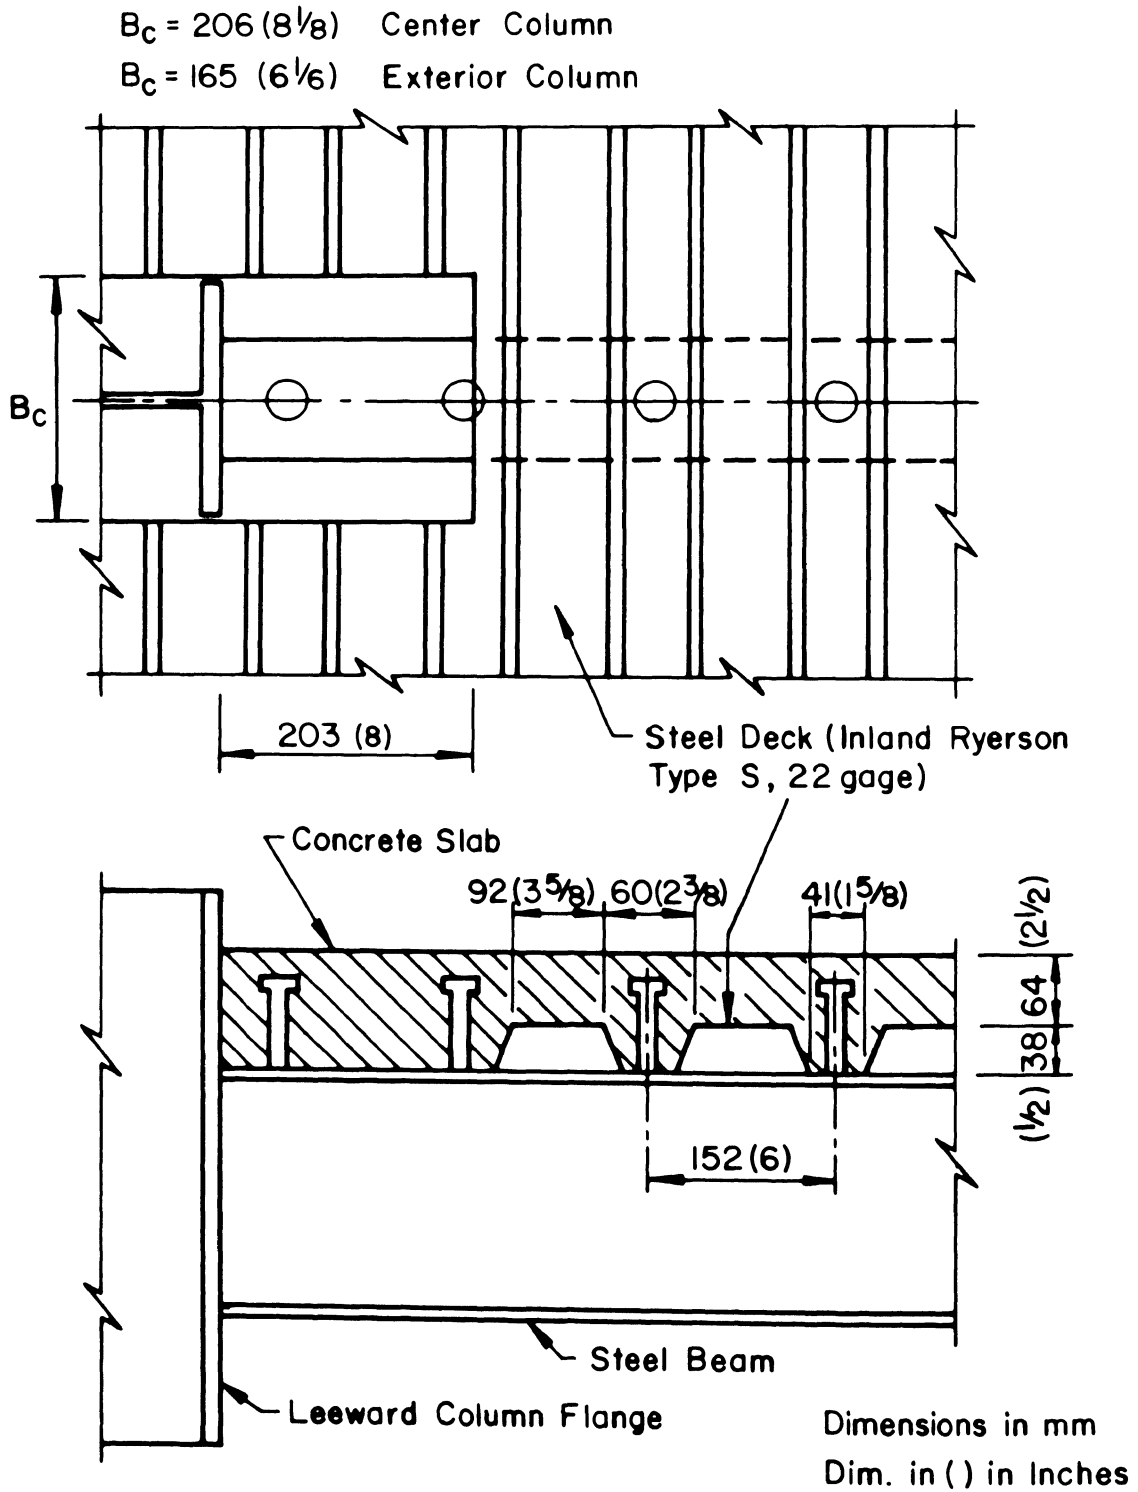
Plan and Elevation View of Leeward Beam-to-Column Connection of CA-2
